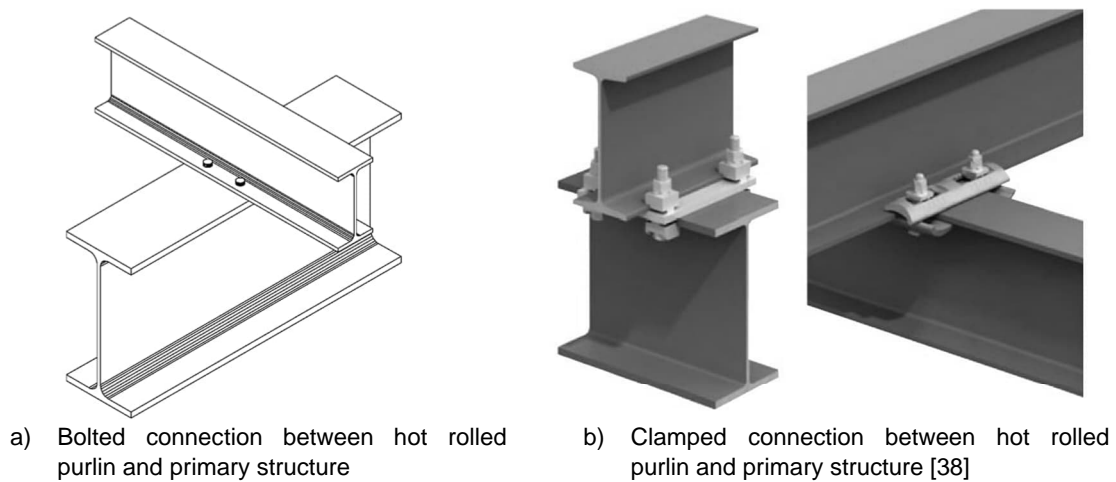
Connections between hot-rolled purlins and primary steelwork
